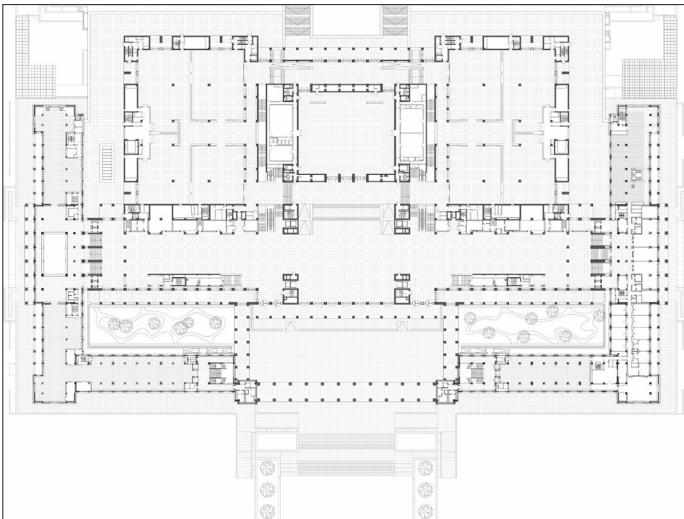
Floor plan (entrance level) of the reconstructed building of 2011, courtesy of gmp 2011
